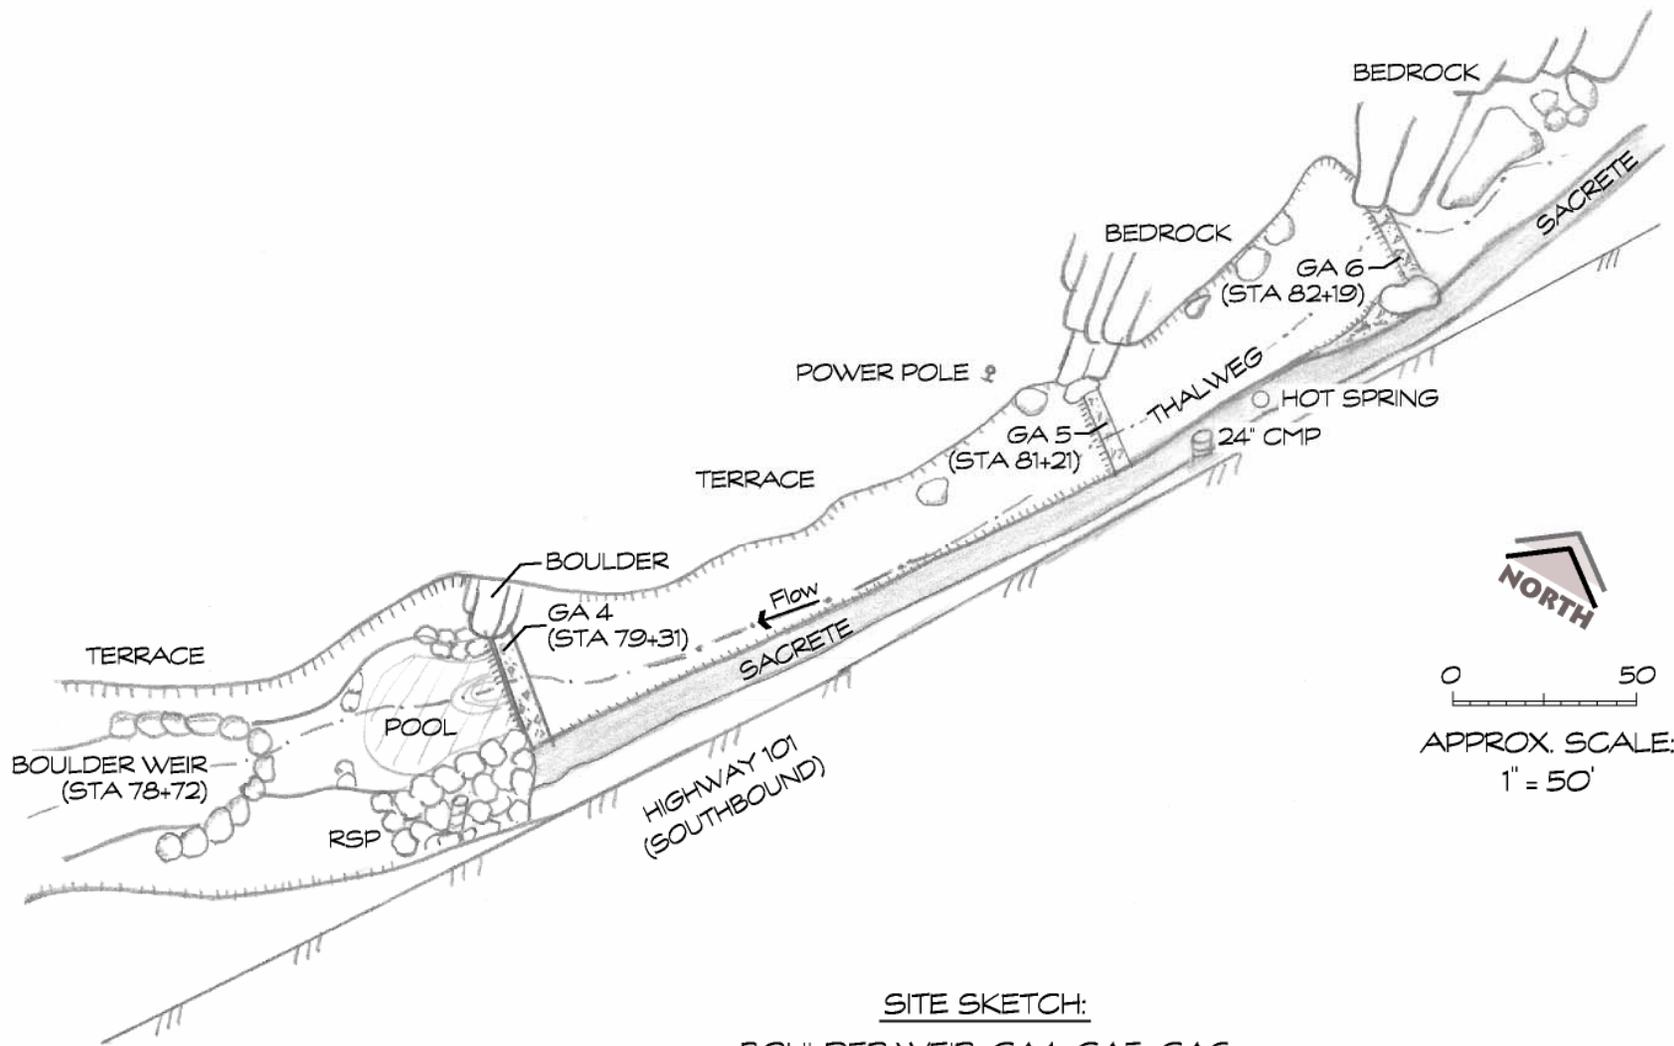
Plan map drawing of the channel reach containing BOULDER WEIR, GA4, GA5, and GA6.
